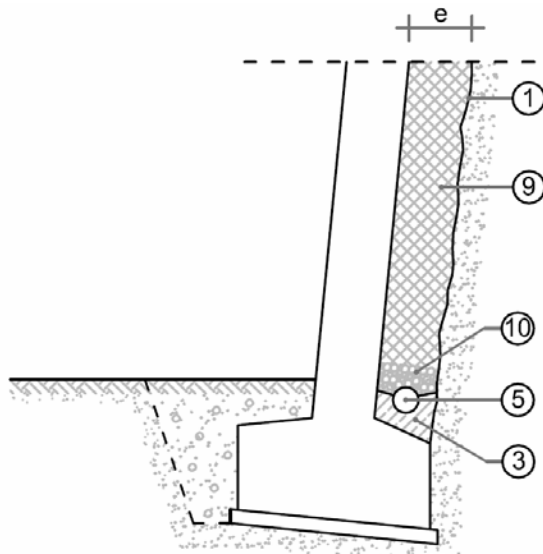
Execution of drainage by means of drain cement concrete (1 excavation, 3 filling concrete, 5 drainage pipe of  $d_{min} = 20$  cm, 9 drain cement concrete, 10 gravel balls 30-50 mm)
